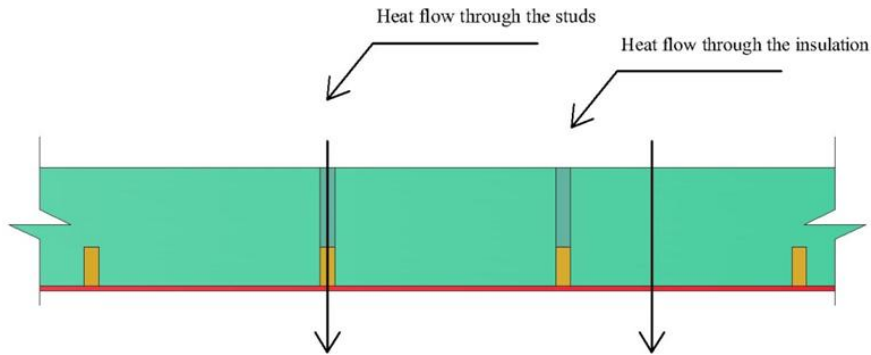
Heat path through the ceiling trusses and through the insulation
